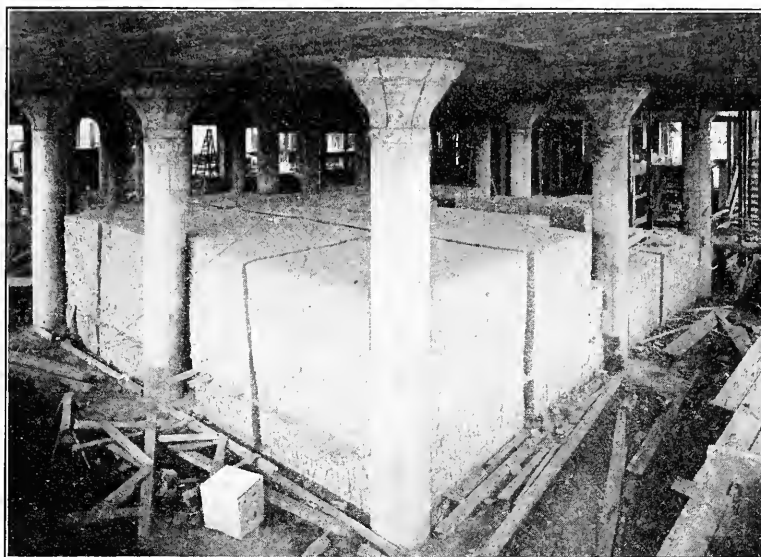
VIEW OF TEST LOAD ON FLOOR OF SCHULZE BAKING COMPANY BUILDING.
